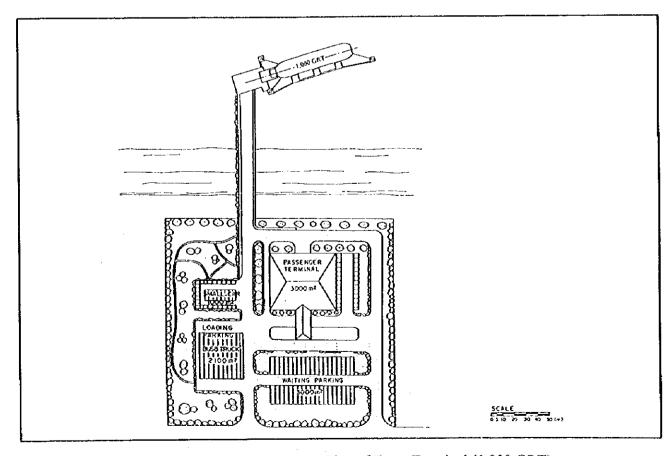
General Layout Plan of Ferry Terminal (1,000 GRT)
